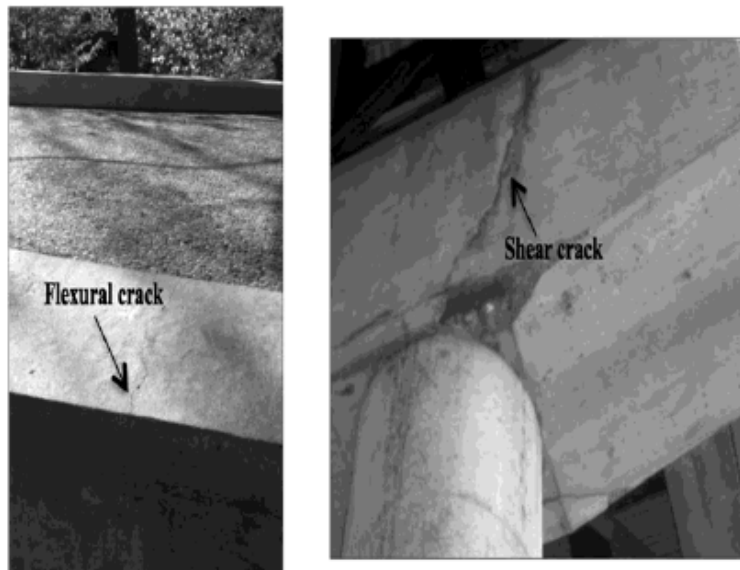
Left: a flexural (transverse) crack in concrete; right: a shear (slant) crack in a concrete beam [22]
